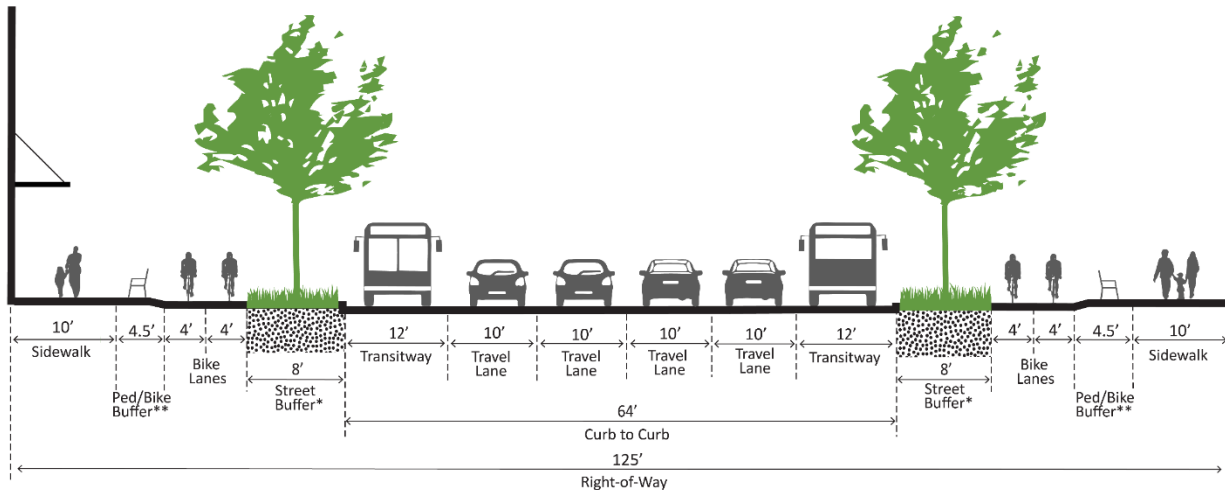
Colesville Road (M-10): Spring Street to Fenton Street, Looking North
